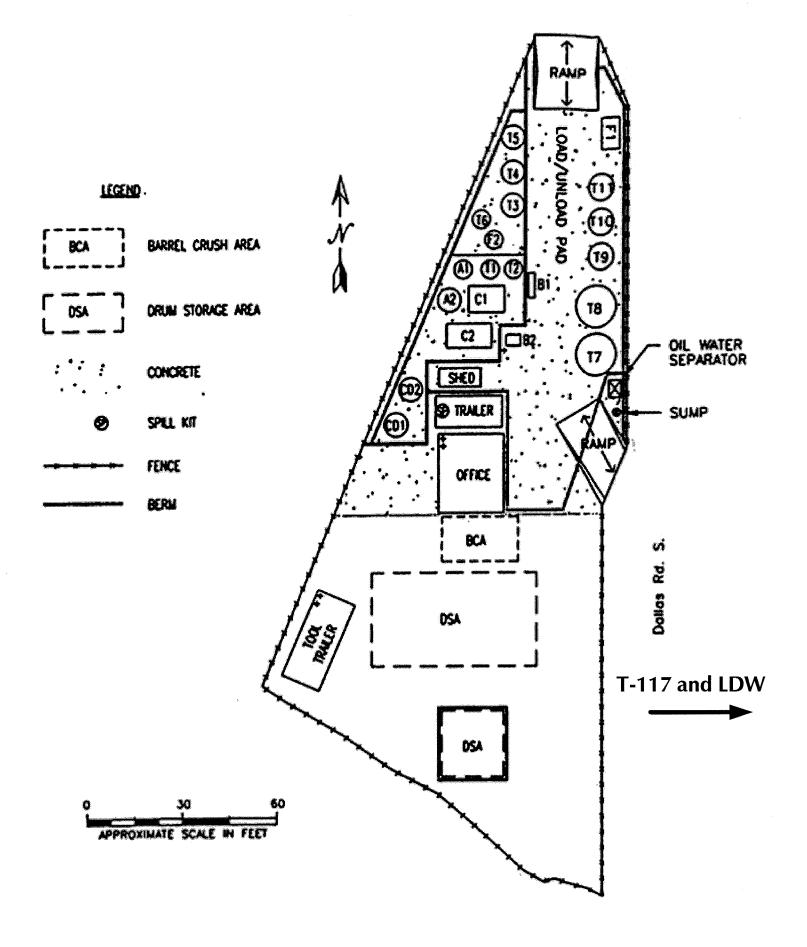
Plan of Basin Oil Plant, 2000 (EMR 2000)
